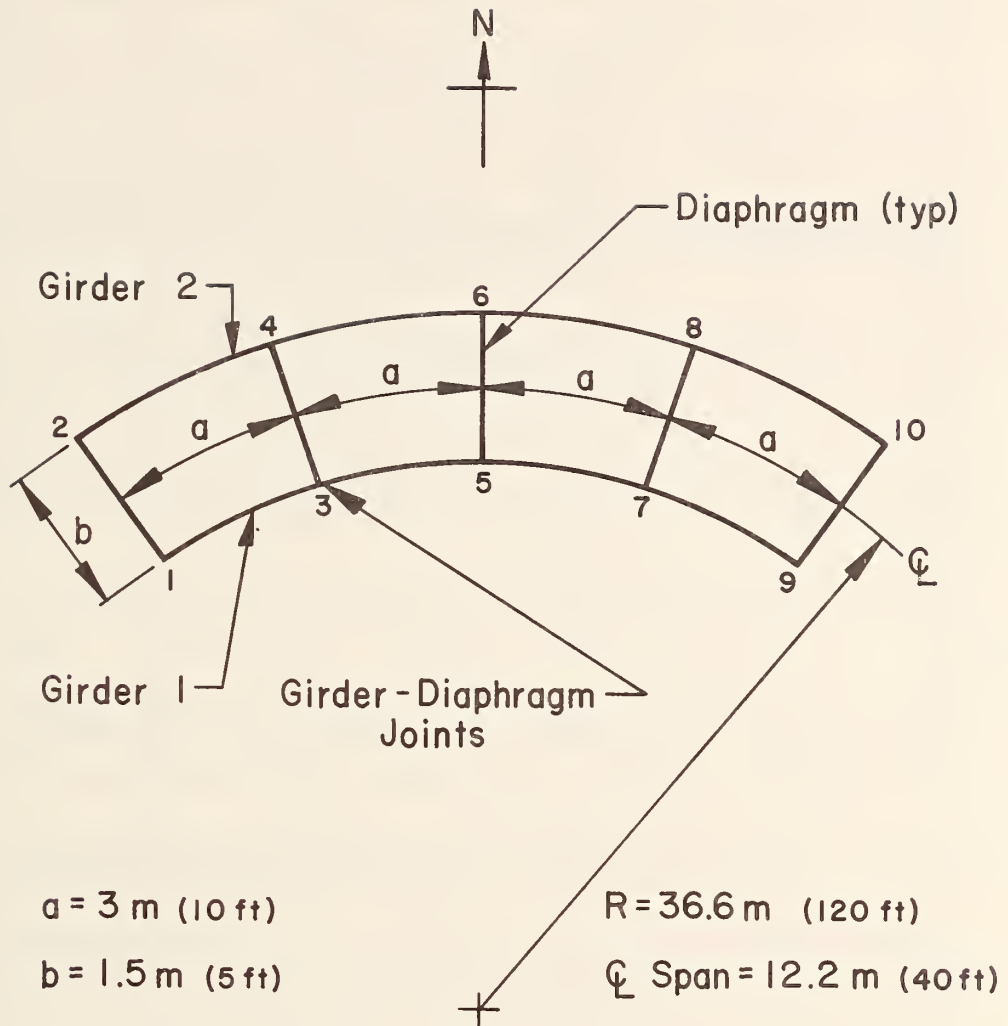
Schematic Plan View of Typical Curved Plate Girder Assembly
